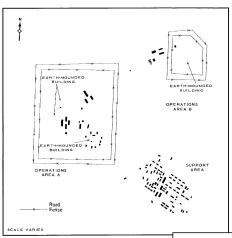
LAYOUT OF CHEKHOV CENTRAL COMMAND FACILITY
